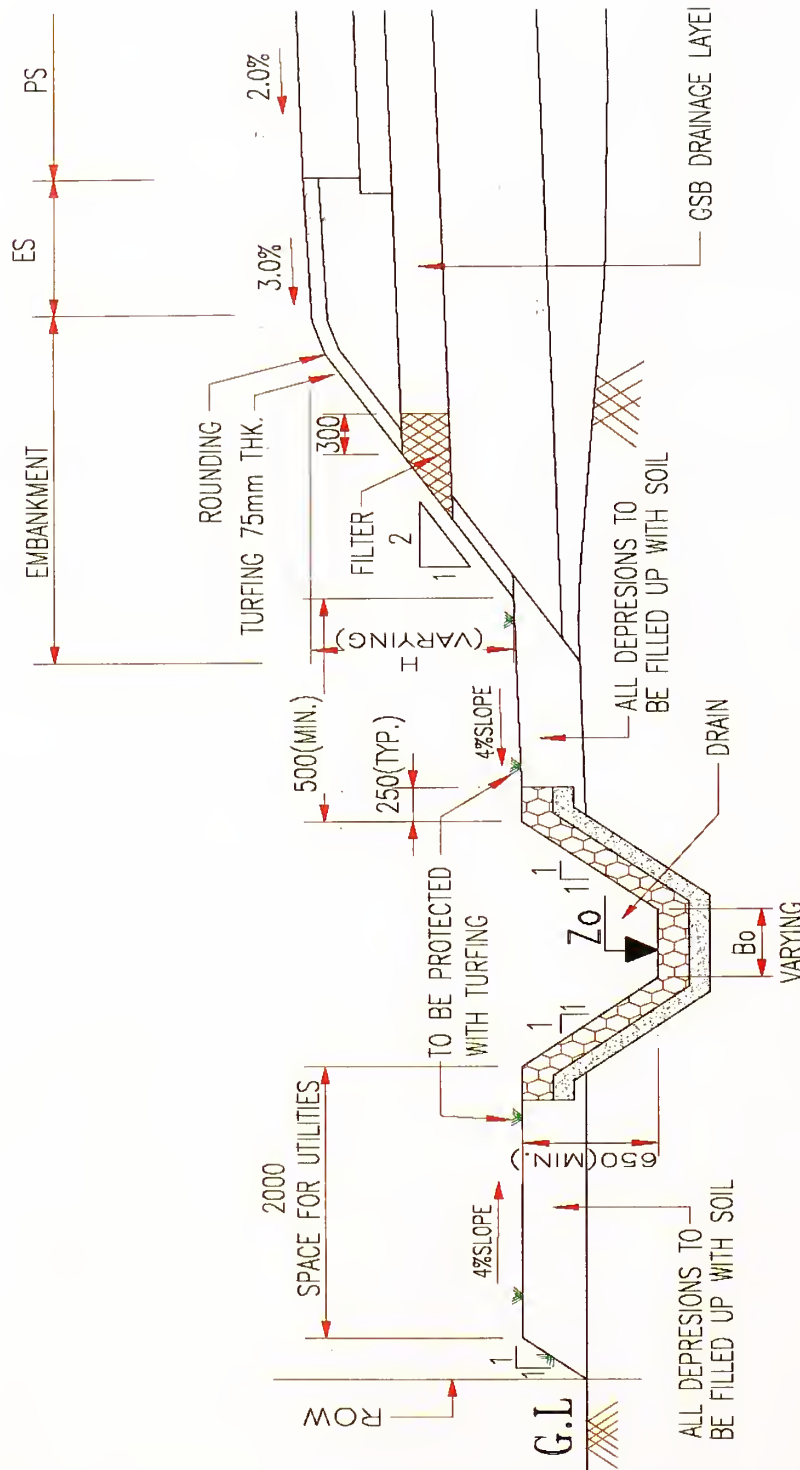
Plan & Section Showing Drainage Arrangements in Urban Areas with Service Road
